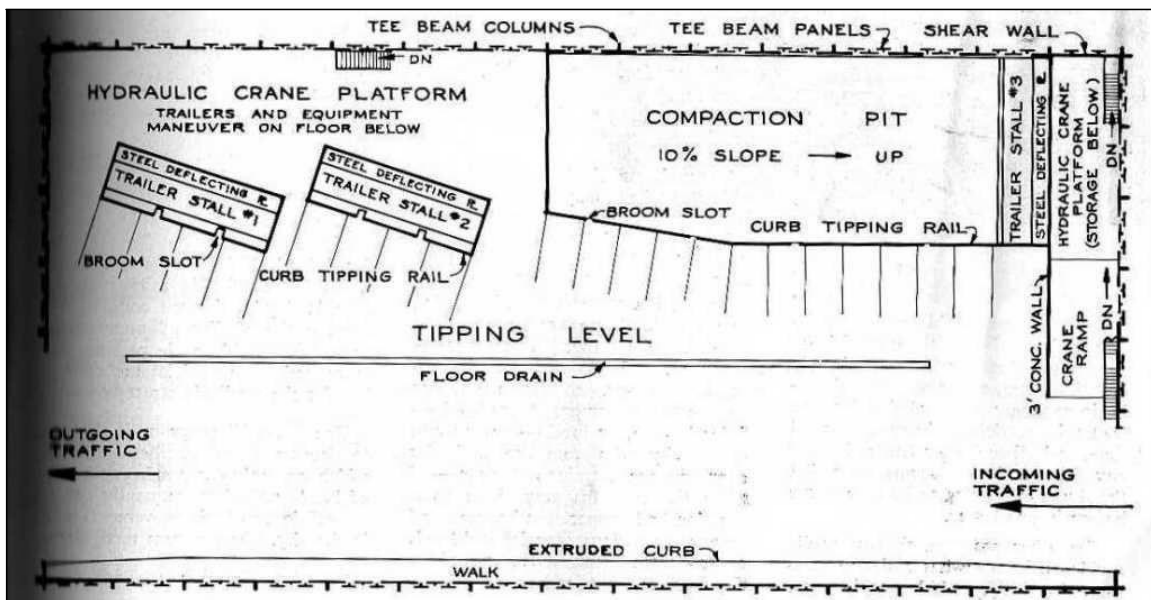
Diagram showing the basic interior configuration of the tipping floor. Also note the configuration of the structural tee-beams and panels. (APWA Reporter, v.34, no.5; June 1967 p. 11)
